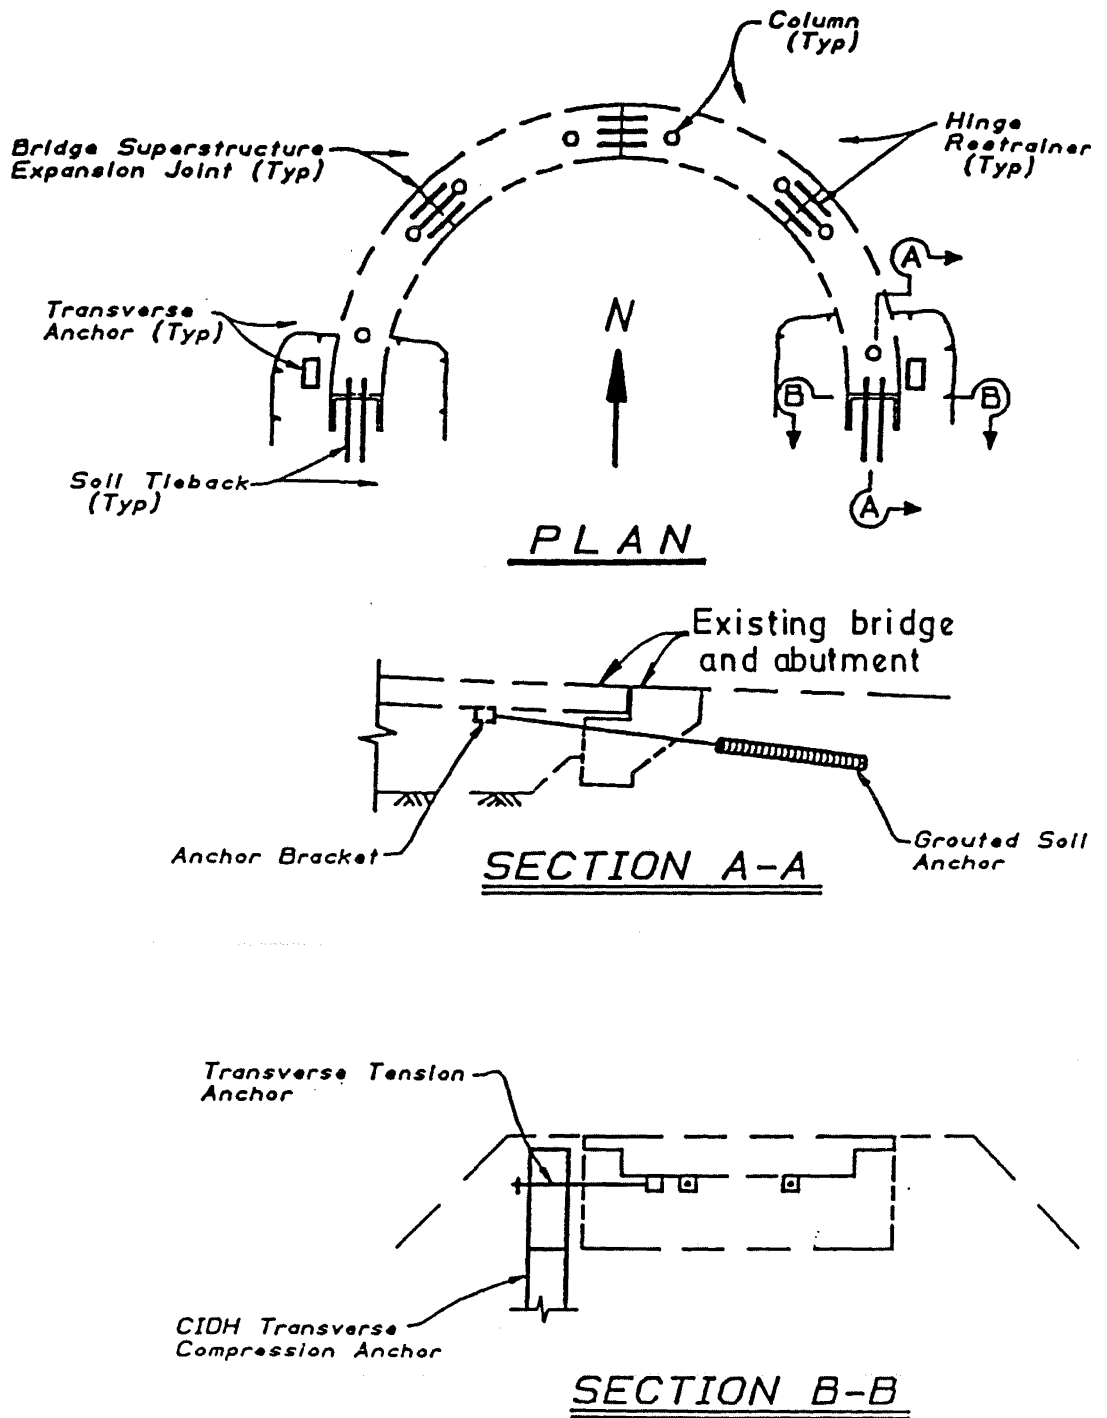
Retrofit of a curved bridge using movement joint restrainers, abutment tension tiebacks, and concrete piles for the transverse anchoring of the abutment [Caltrans 1992].
